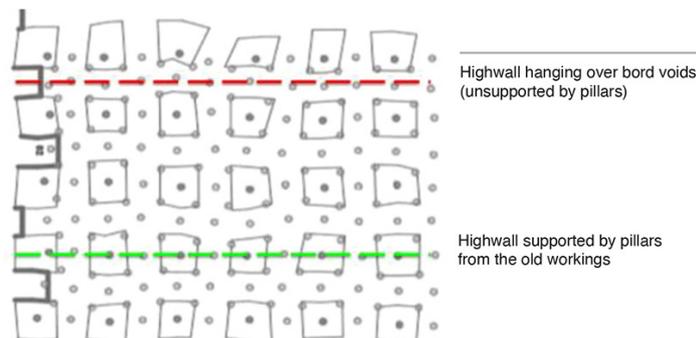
Highwall supported by pillars vs highwall hanging over bord voids
